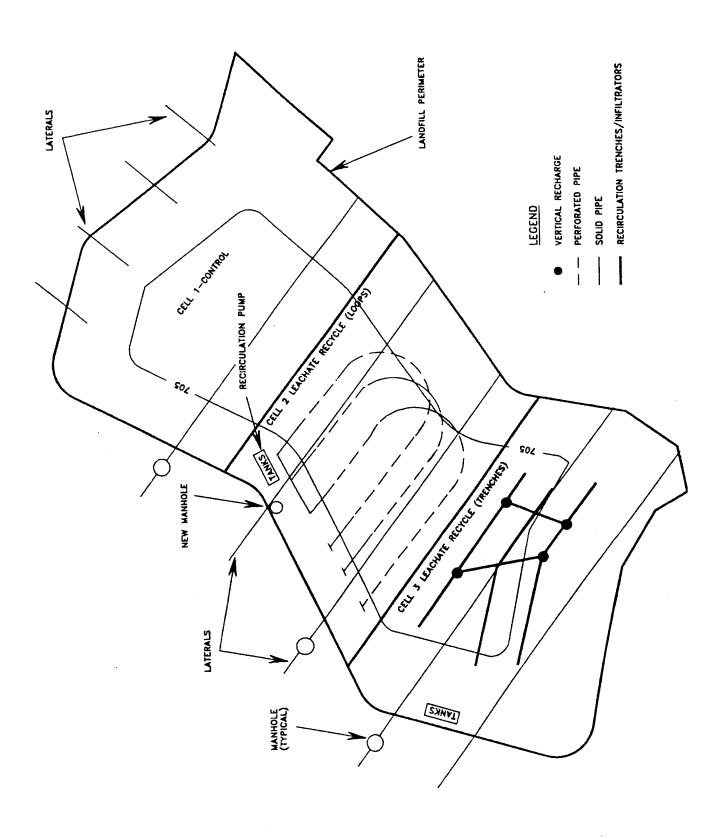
Mills Seat Landfill (Rochester, NY) recirculation layout (elevation 215 m).
